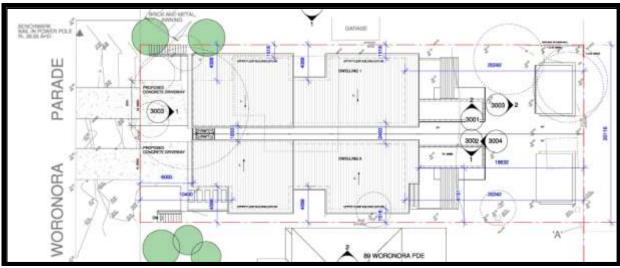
Proposed Site Plan - 87 Woronora Parade, Oatley
